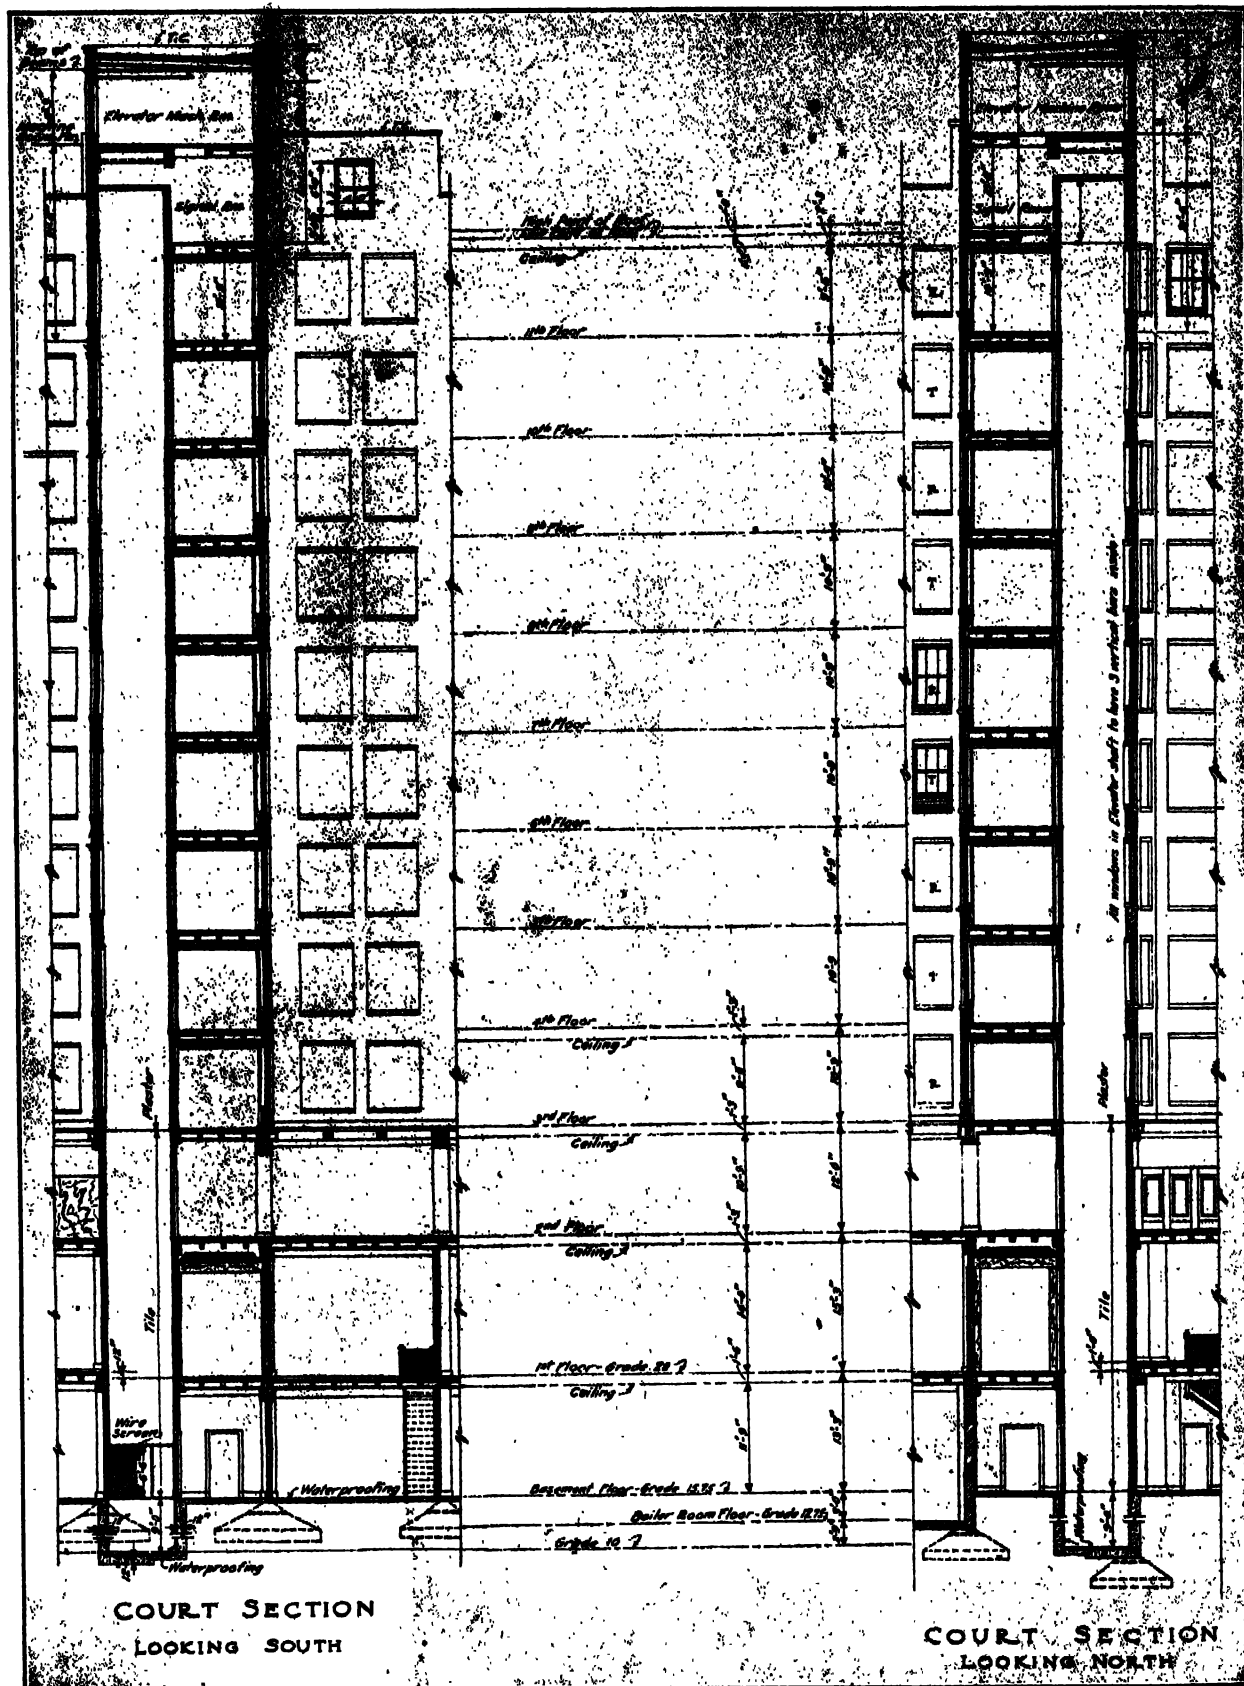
ARCHITECTS' SECTION OF ELEVATOR SHAFTWAY
